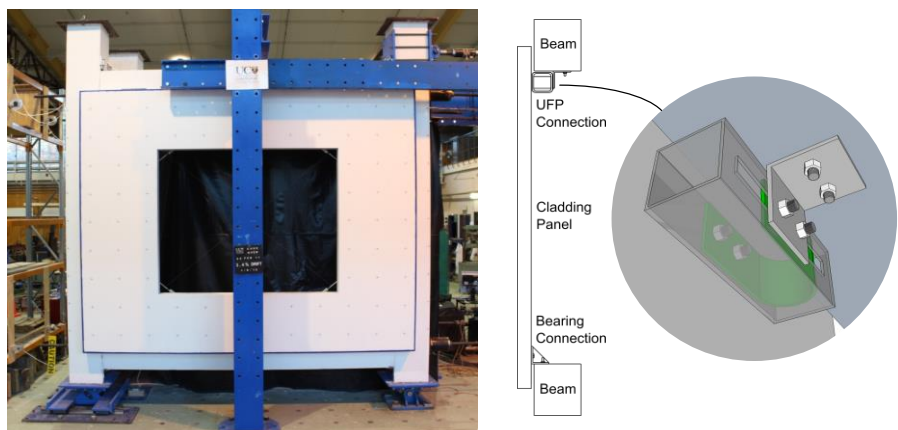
Low-damage solution for precast concrete facades with UFP connectors (after Baird et al., 2014)
